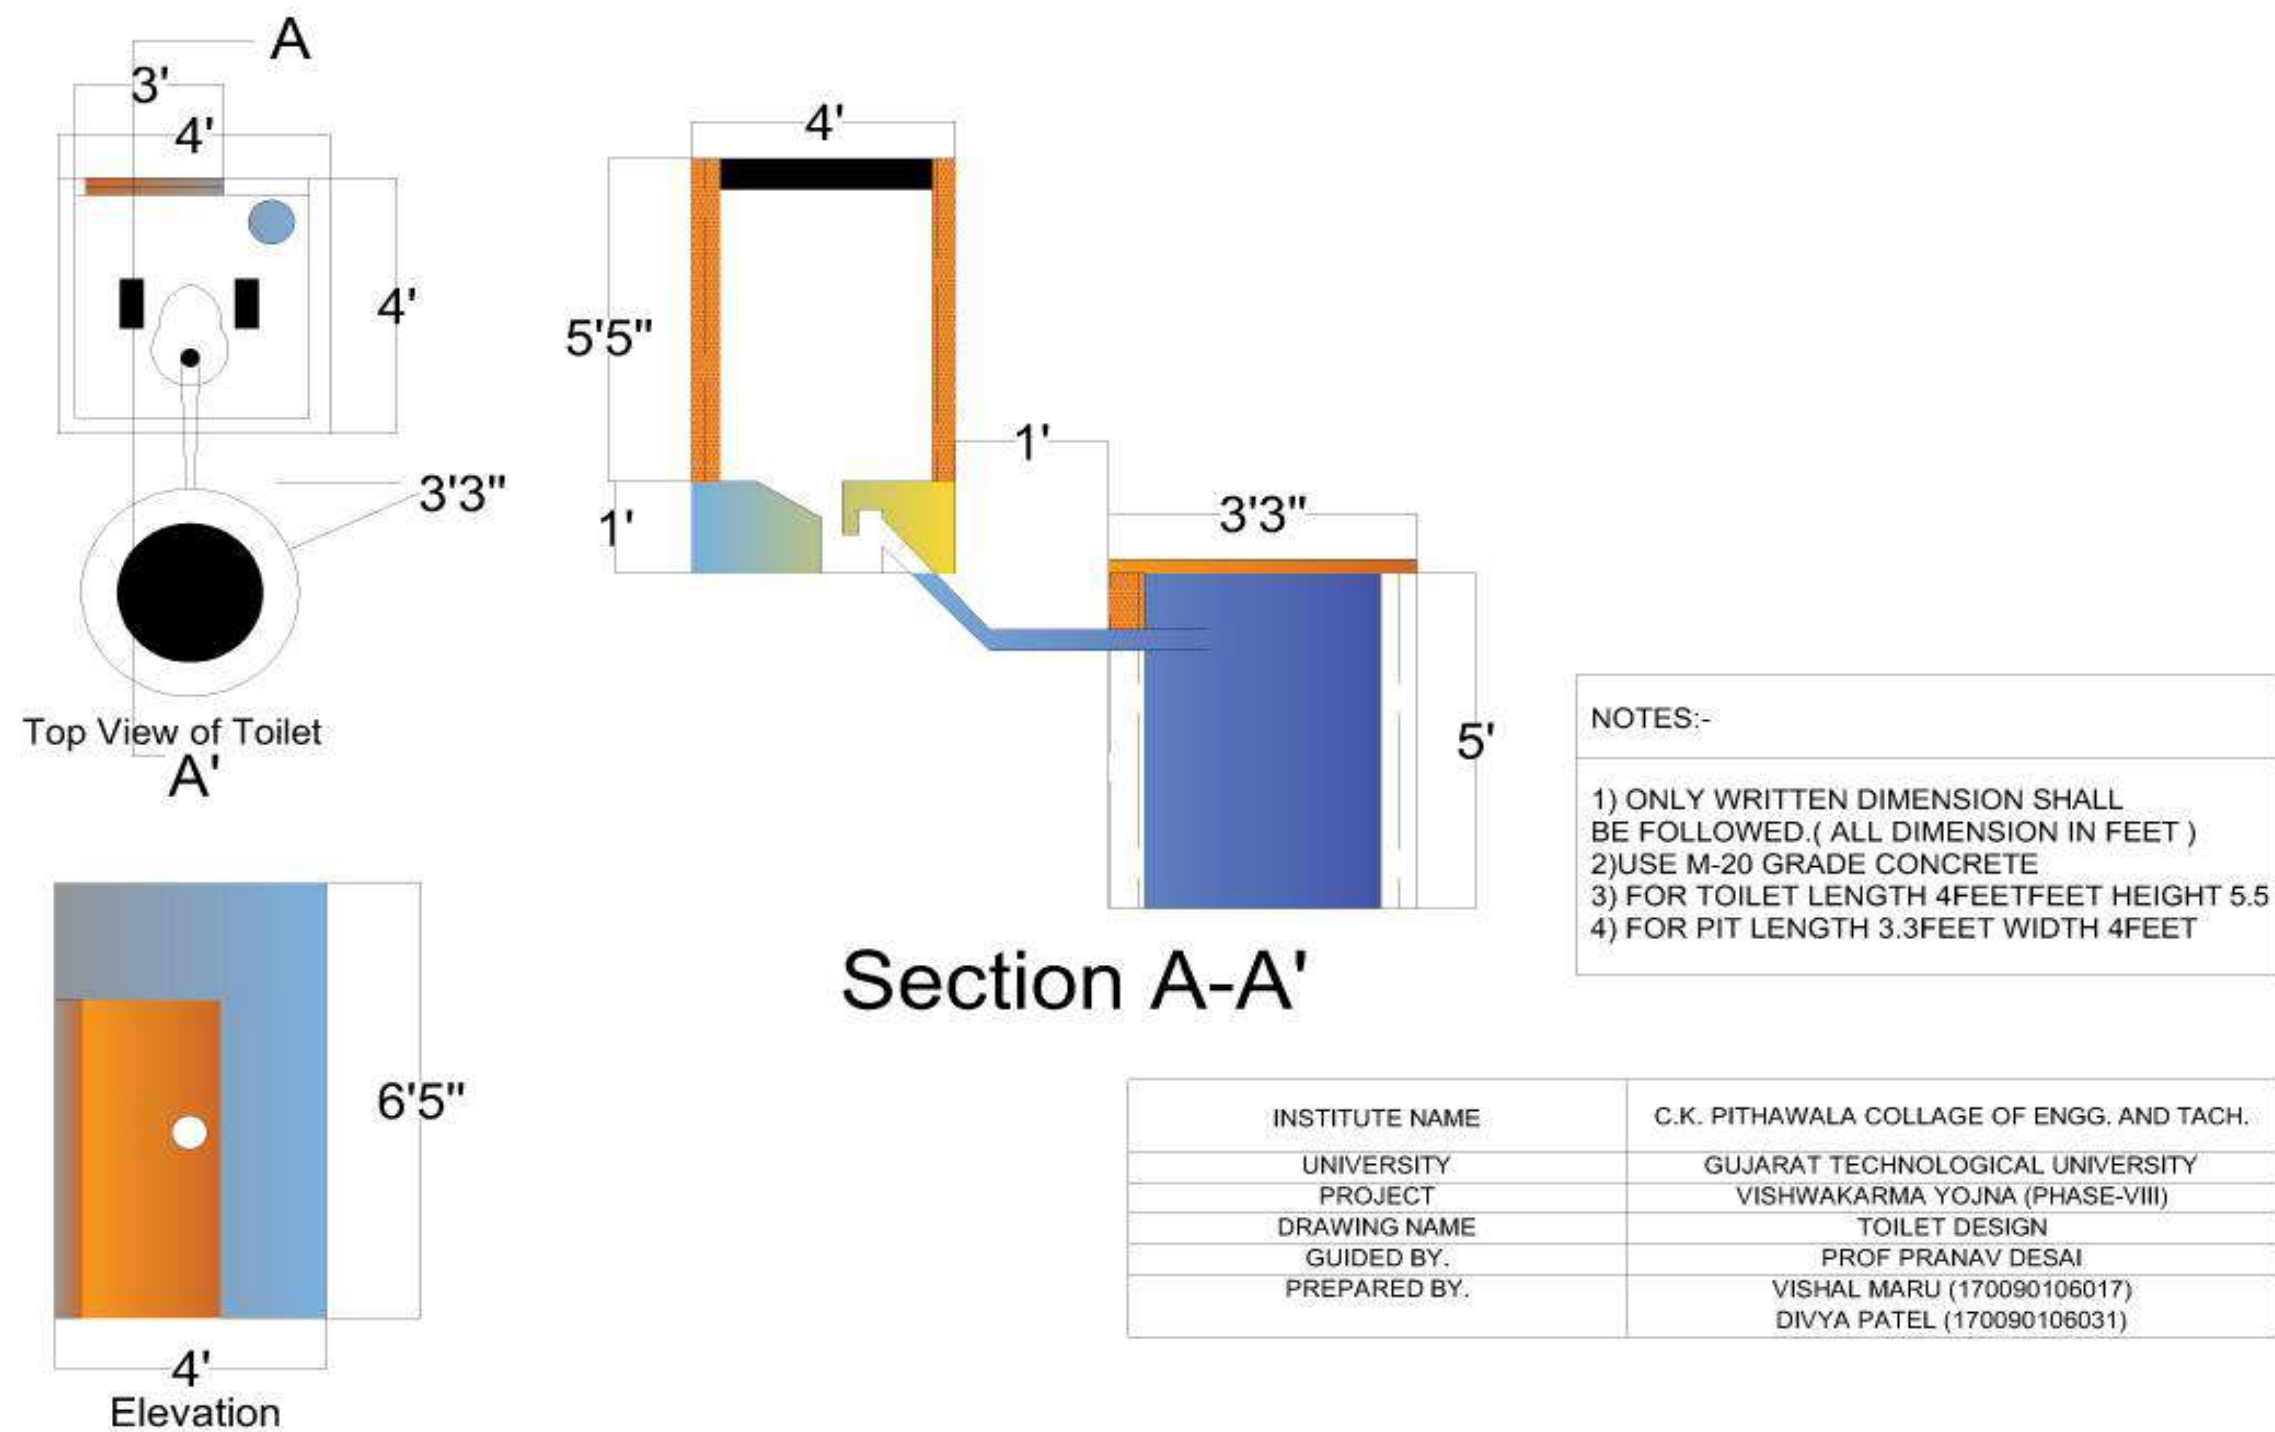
Cross Section (plan), Elevation, Top View of Low Cost Toilet
